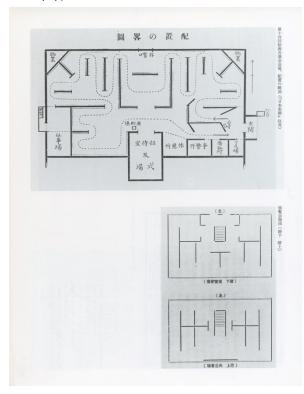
'Dai 14-kai kaiga kyōshinkai kaijō haichizu 第14 回絵画共進会会場配置図 [Floor Plan of the 14th Painting Competitive Exhibition]' (1903)
